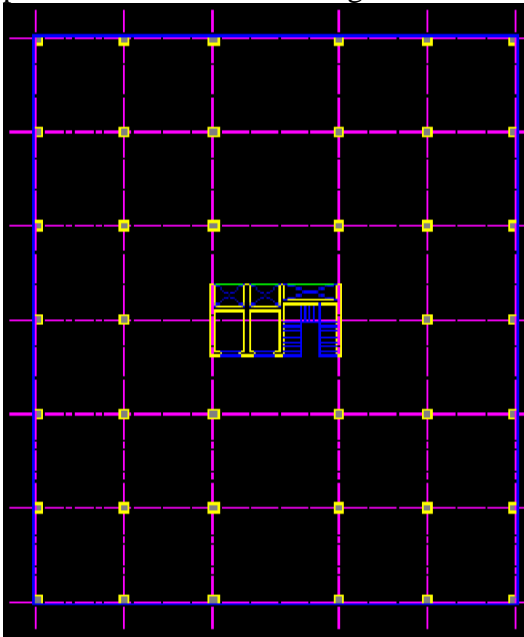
Plan of a G+20 storey building with dimensions 32.65mx36.3m
